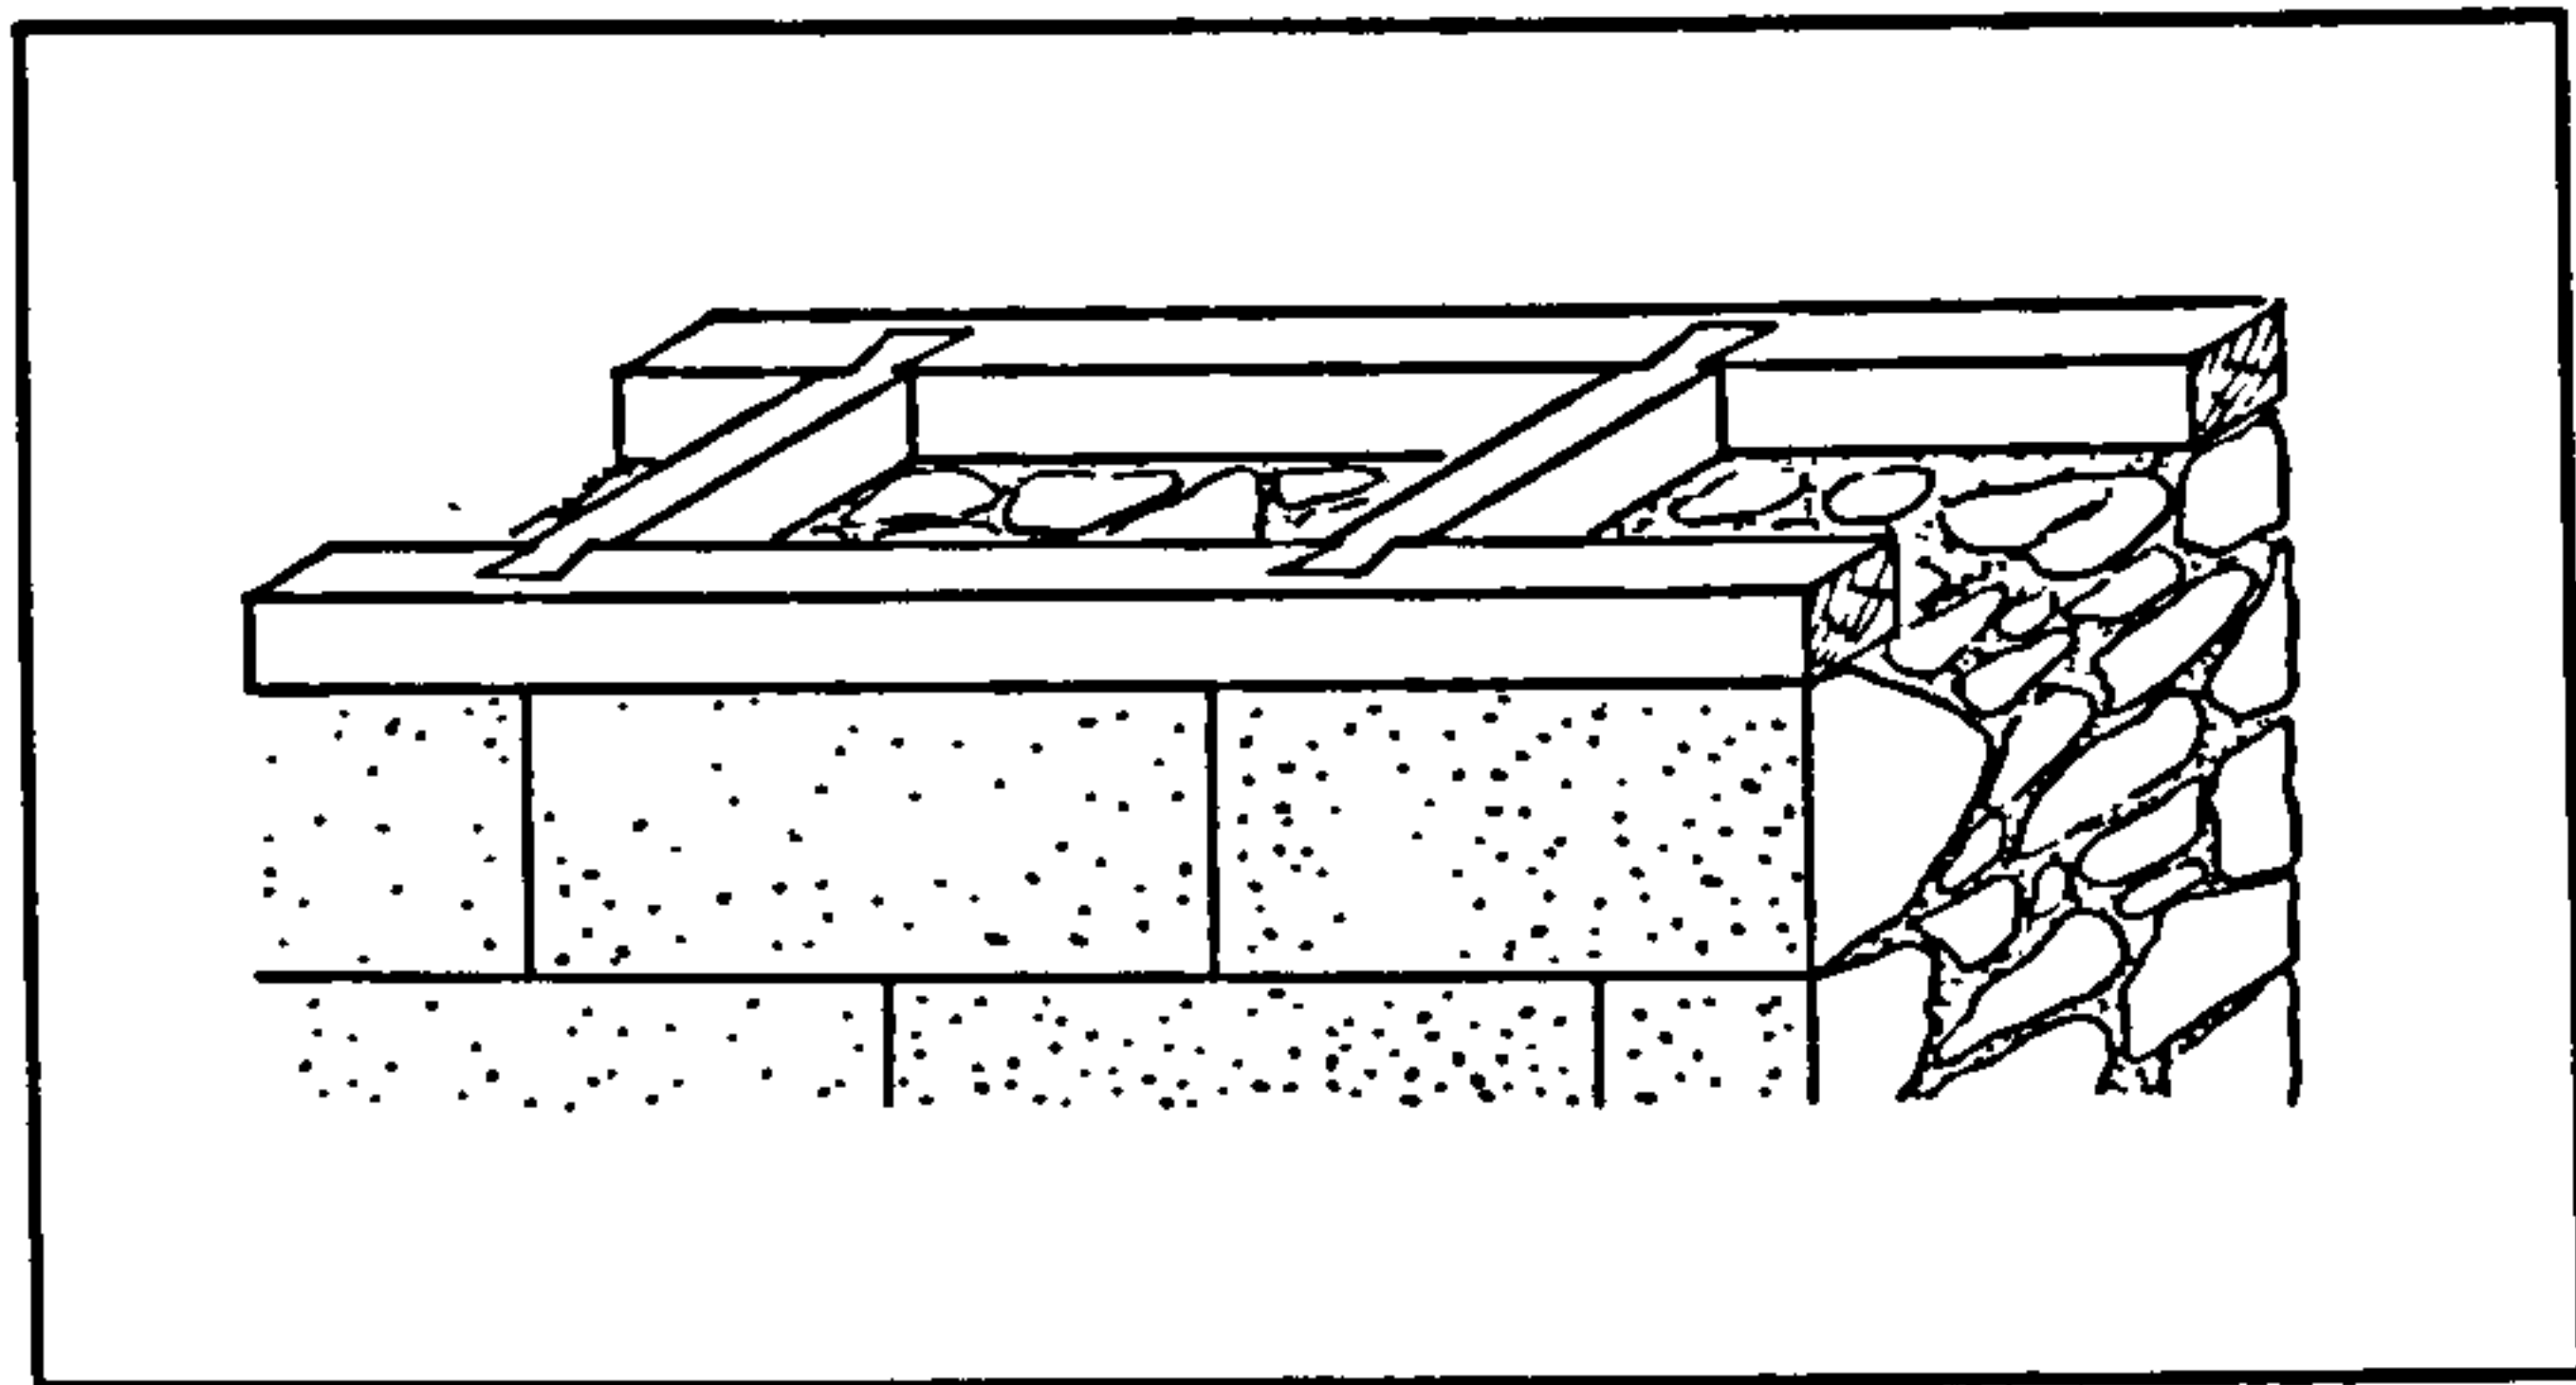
Horizontal reinforcements structures. The dovetail joint is based on structural considerations not on archaeological evidence. Drawing by the author.
